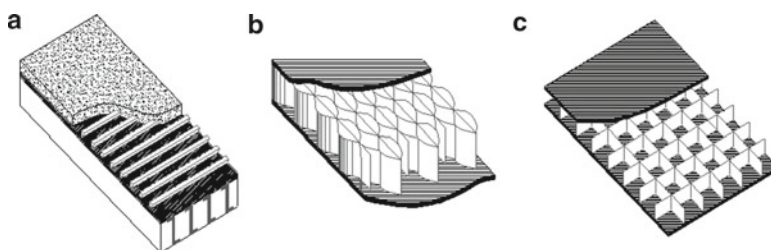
Examples of sandwich panel reinforced concrete deck: (a) GFRP/concrete hybrid panel; (b) honeycomb core panel; and (c) truss (web) core panel
